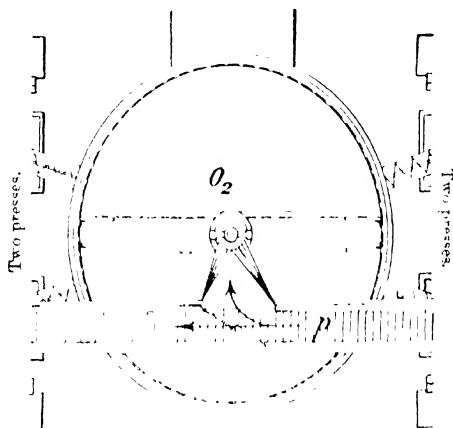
Distribution of bag-petting mixture to several heating ovens by means of conveyor. Plan.
